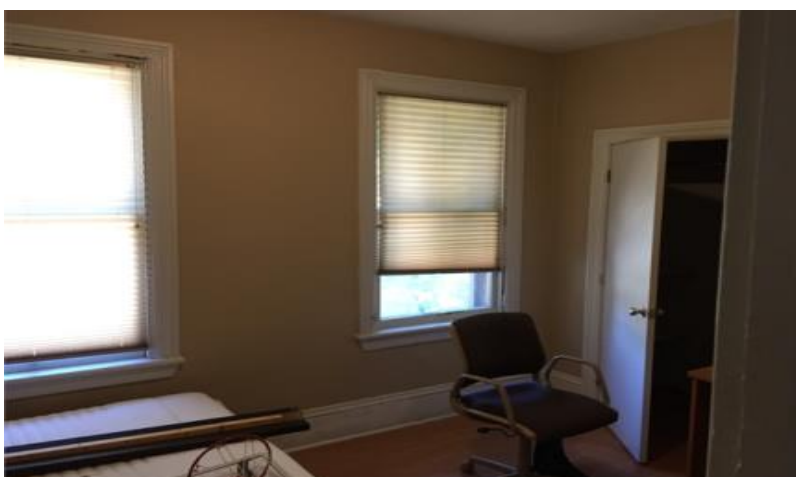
View of typical finishes observed at the building located at 120 Henderson Avenue.
